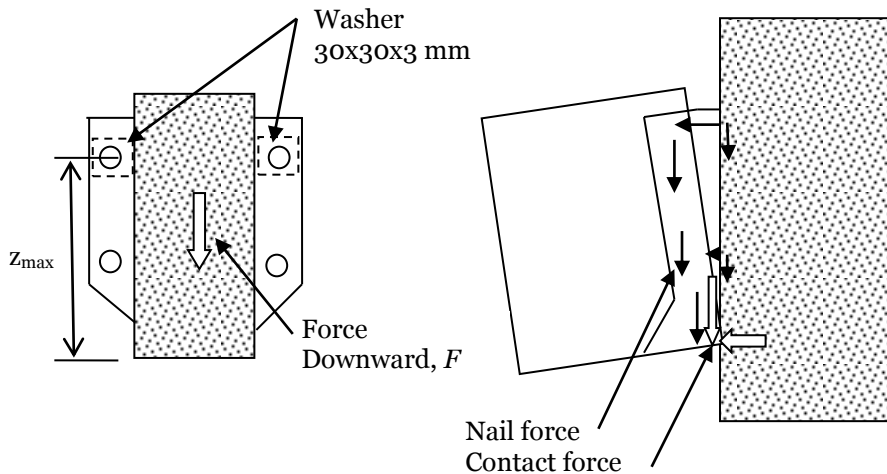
Left: Cross section in joist. Right: The joist will deflect and rotate, at the bottom a contact force will occur at the bottom plate, and the withdrawal forces in the bolts in the wall will vary linearly as assumed for nailed connections in the header.
